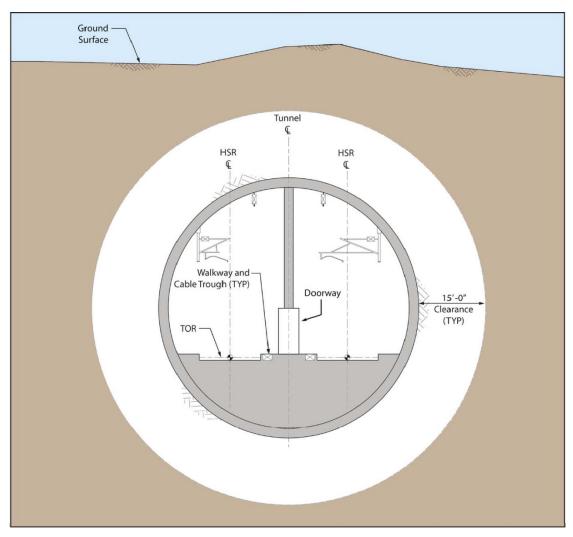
Typical High-Speed Rail Tunnel Cross Section in Single Tunnel
